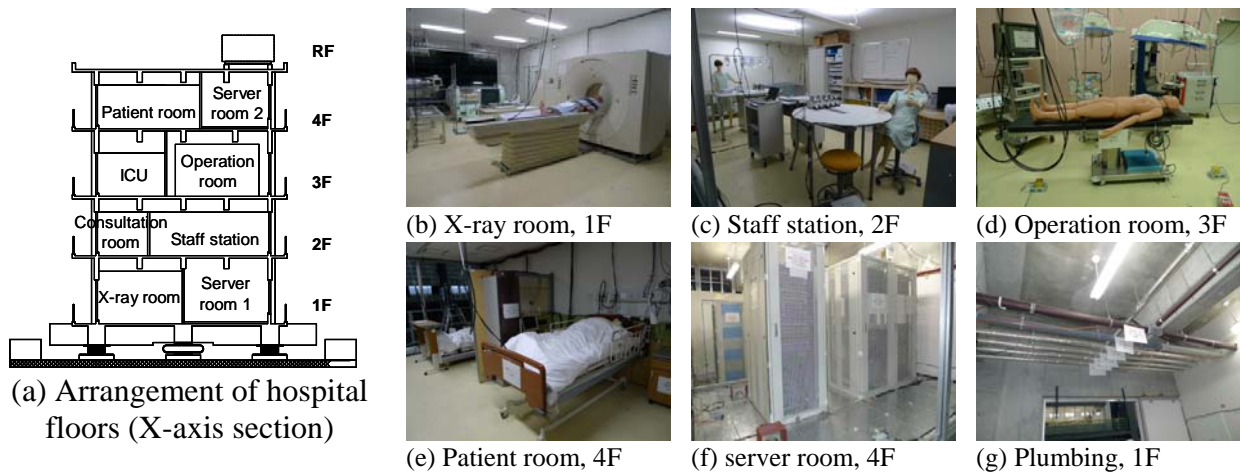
Arrangement of hospital floors and various apparatus installed in specimen
